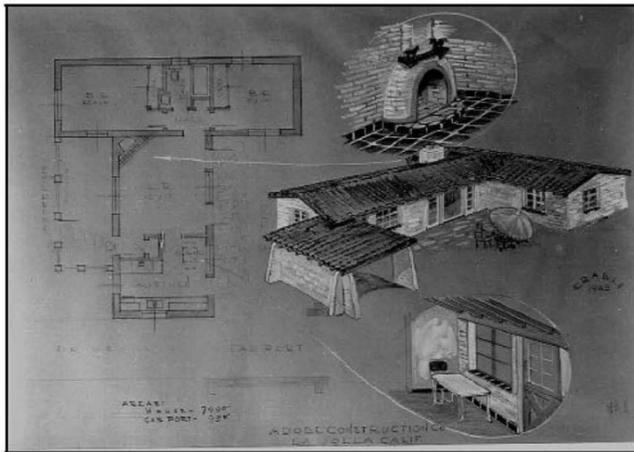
Plans for a modern adobe with Spanish and California ranch influences, Adobe Construction Company, La Jolla (ca. 1949) [Escondido History Center Photographic Collection]
